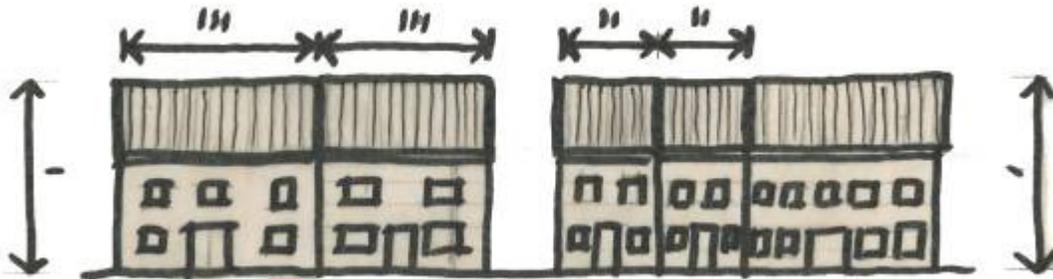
(B): Buildings should not duplicate building mass and scale exactly as adjoining buildings.
